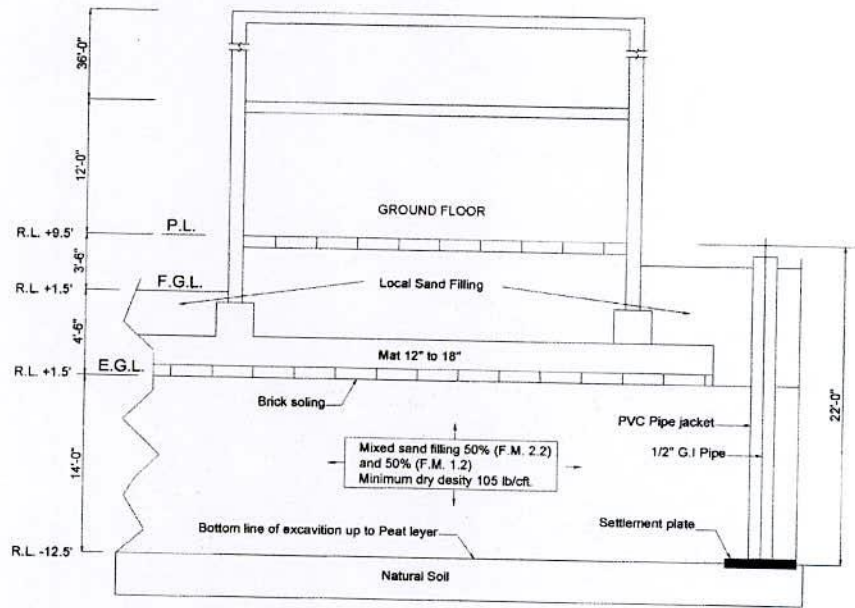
Mat foundation on engineered fill for academic building-I at Khulna University area (after Razzaque and Alamgir, 1999).
